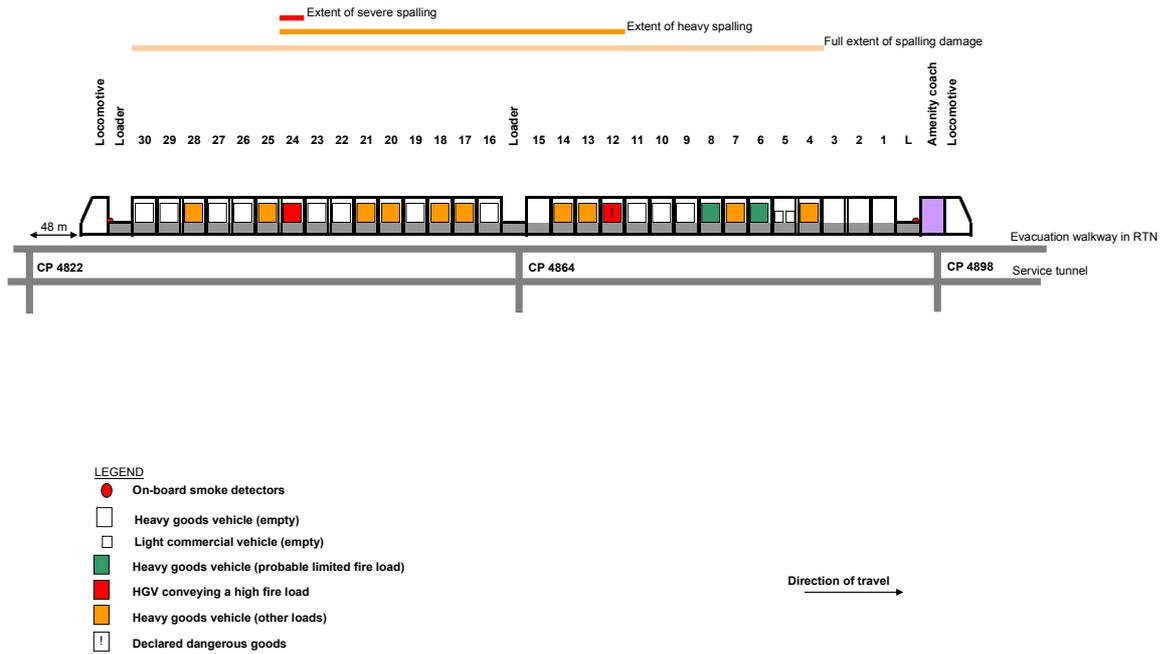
Location of mission 7412 when stopped in the Running Tunnel North (RTN) and the associated damage suffered by the tunnel lining
